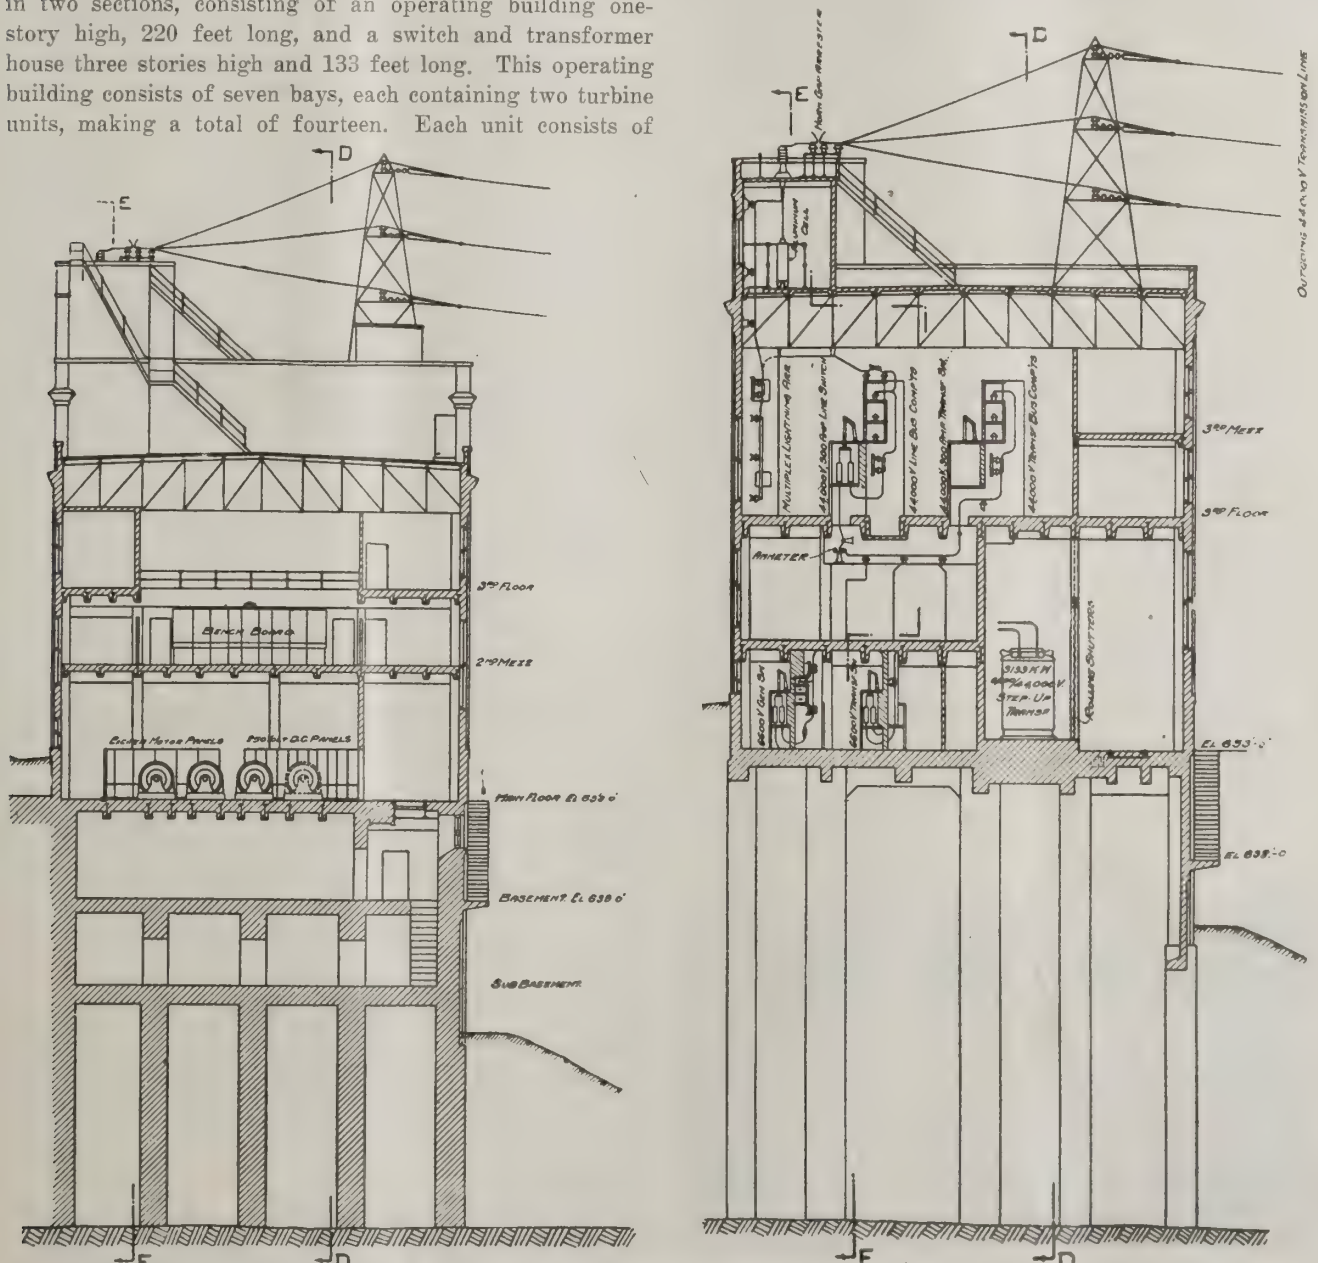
SECTIONS THROUGH HALES BAR STATION.
